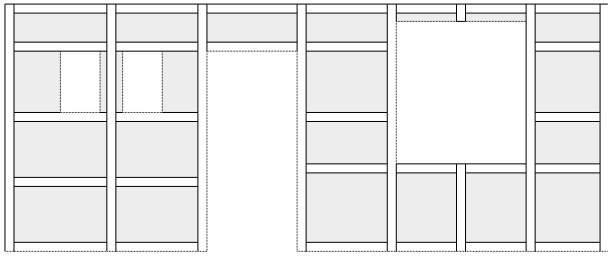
Plywood-aluminium structure layout on the first case study facade
